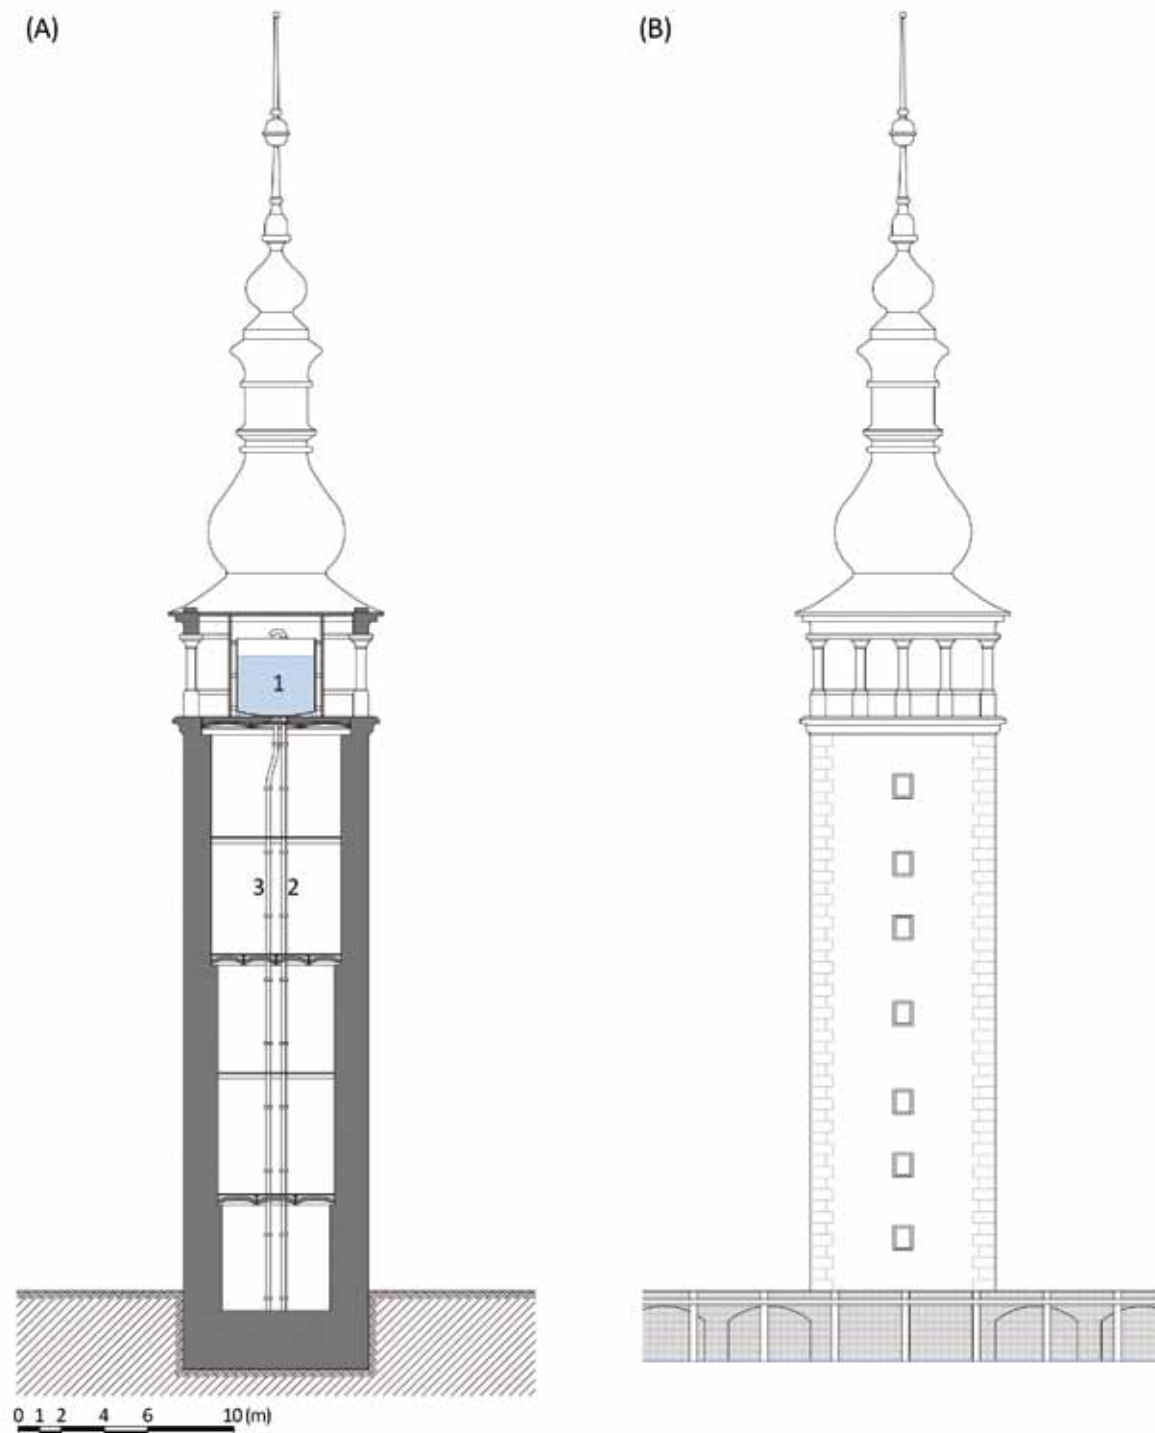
Prague – The Old Town Water Tower was built for the purposes of the Old Town Waterworks: (A) section; (B) elevation; 1 – convex-bottom cylindrical tank, 2 – inlet pipeline, 3 – outlet pipeline. Diagram by Radek Mišanec, 2021 (modified according to: plan from PVK archive, unsign.).
